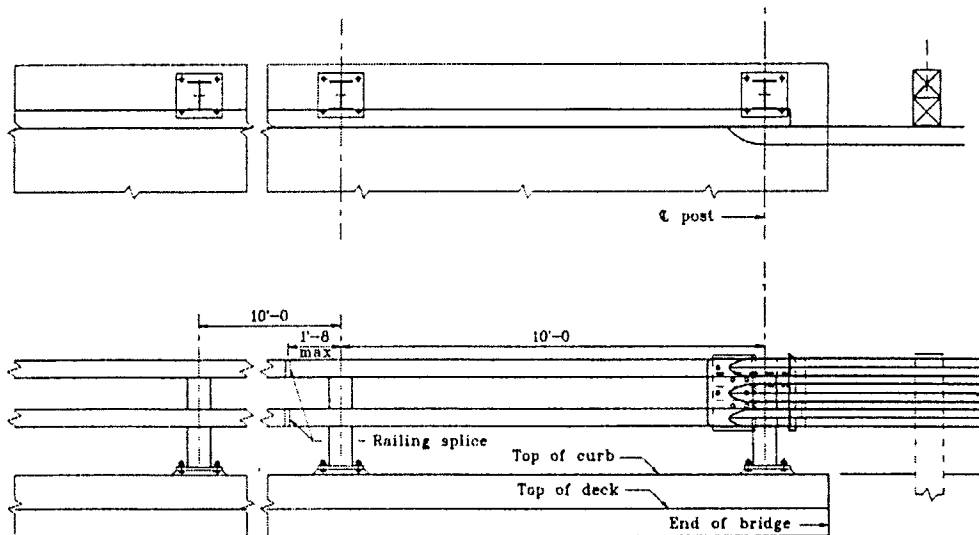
Type CF-1 Bridge Railing (Elevation View)
